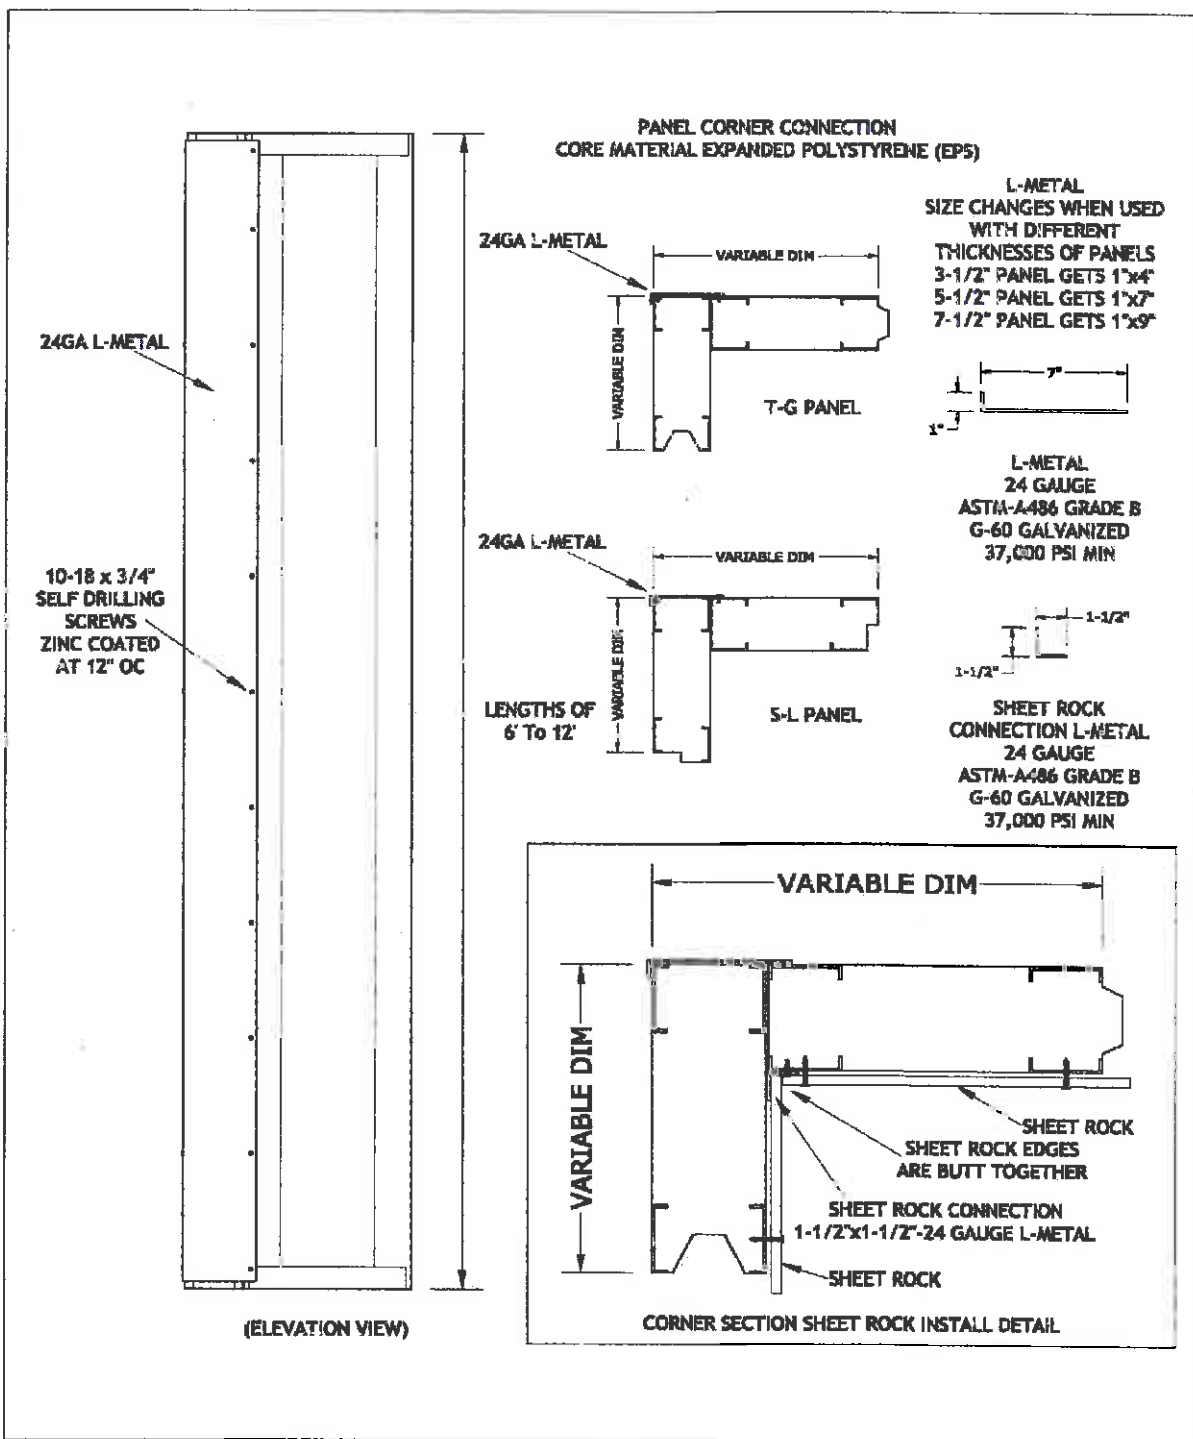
T-G/S-L Wall Corner Detail and Gypsum Installation
